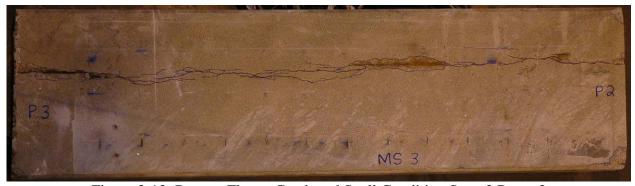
Bottom Flange Crack and Spall Condition Span 3 Beam 3
